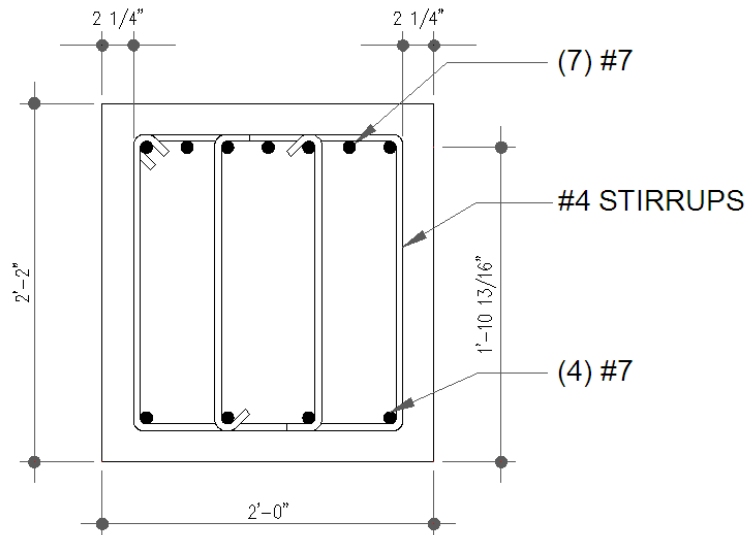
Midspan Detail of Typical Sloped Reinforced Concrete Beam of Moment Frame in East/West Direction
